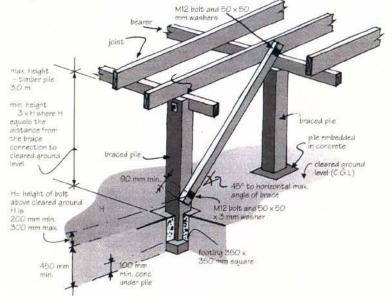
Braced Pile Solution, Braced from Pile to Joist (Source: BRANZ 2000)
